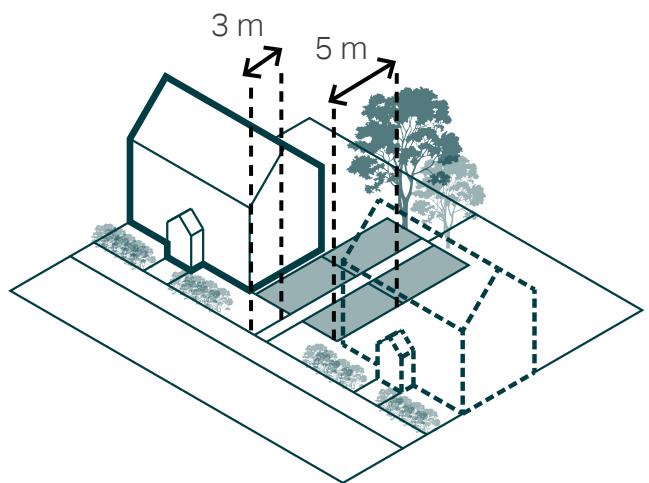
Illustrative diagram showing an indicative layout of on-plot side parking
